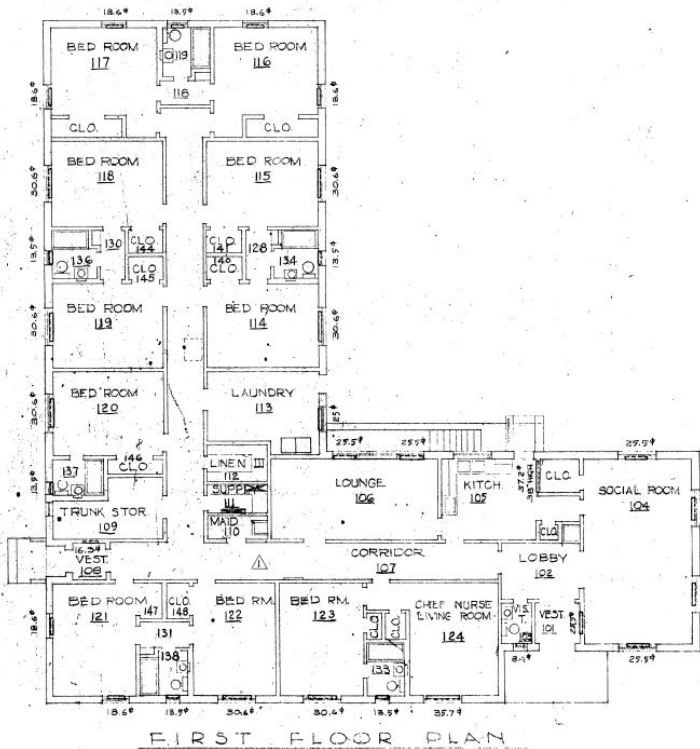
1948 architectural drawing of the floorplan of the Nurse's Quarters.
